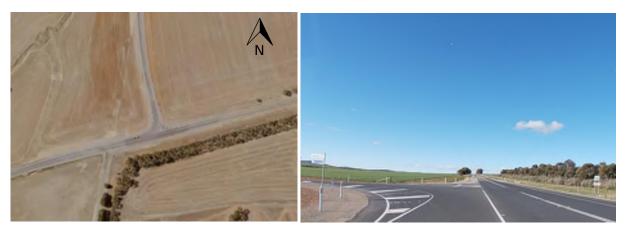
Copperhouse Road and Barrier Highway intersection, looking east along the Barrier Highway.
